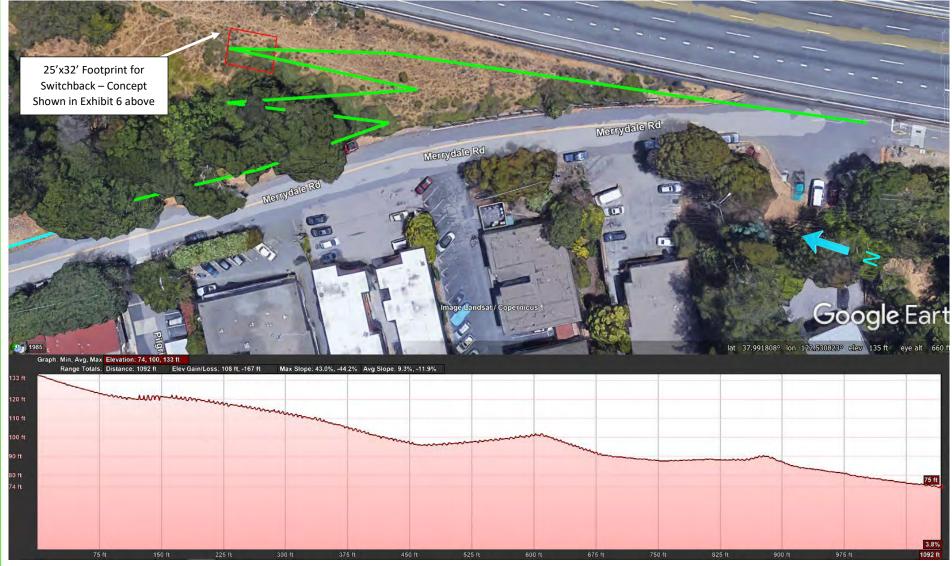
Plan and Profile - Grade to slope no greater than 5%
